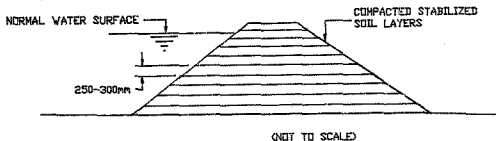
The 'Solid' Stabilized Soil Embankment Dam
